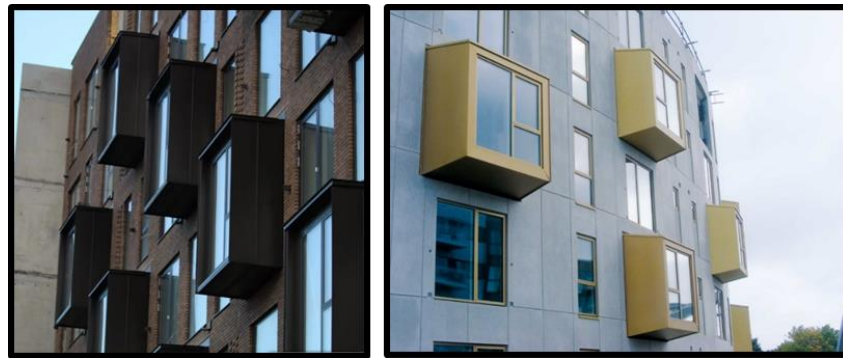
Modern buildings in Denmark that use this façade extension in their façades.
